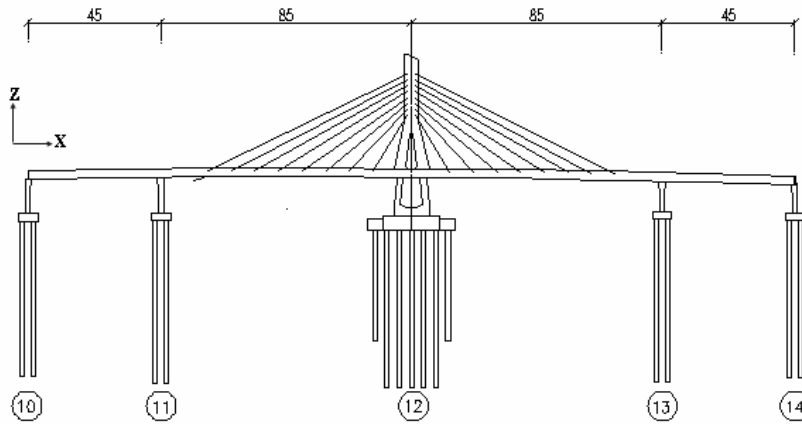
Elevation of the Shihuan Highway Bridge (units: m)
